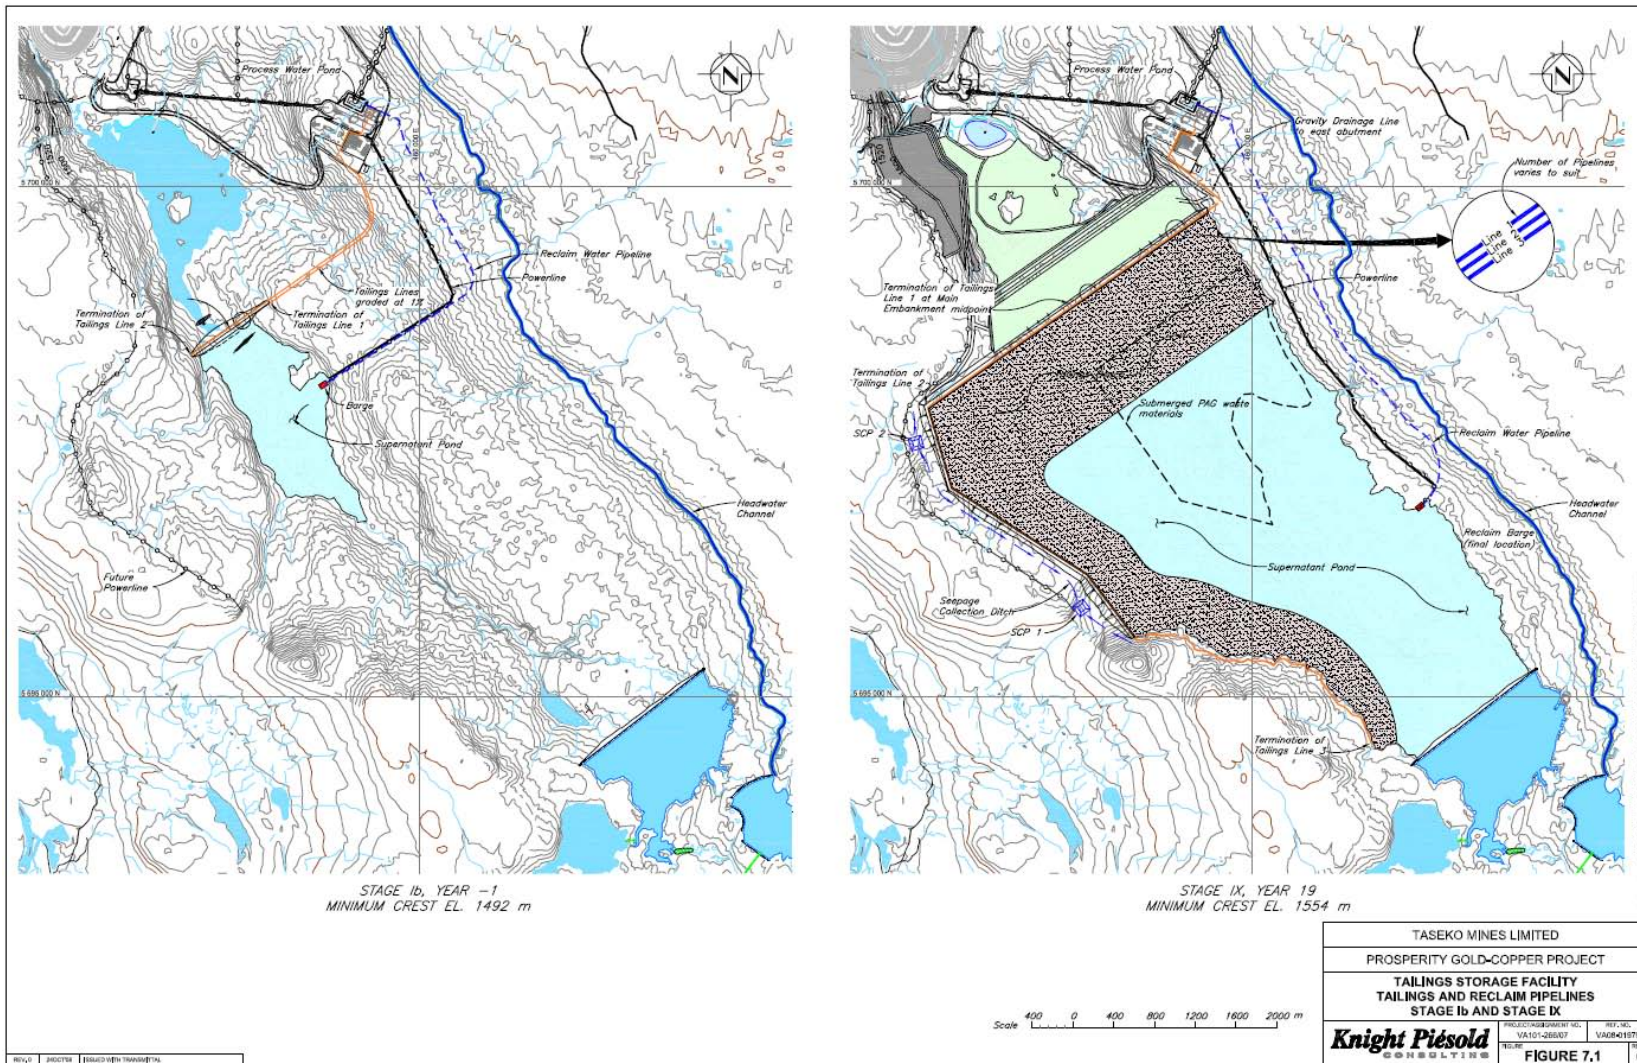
Tailings Storage Facility–Tailings and Reclaim Pipelines–Stage Ib and Stage IX
